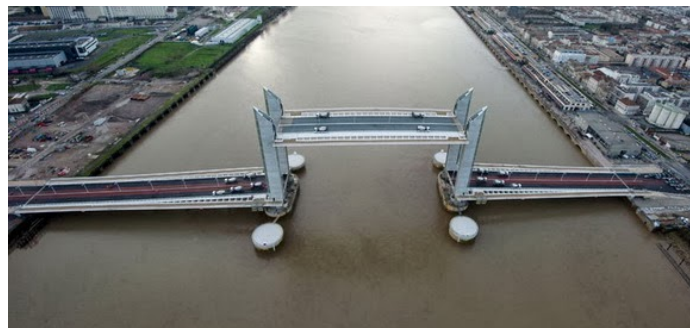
Pont Jacques Chaban-Delmas, France Vertical-Lift Bridge
